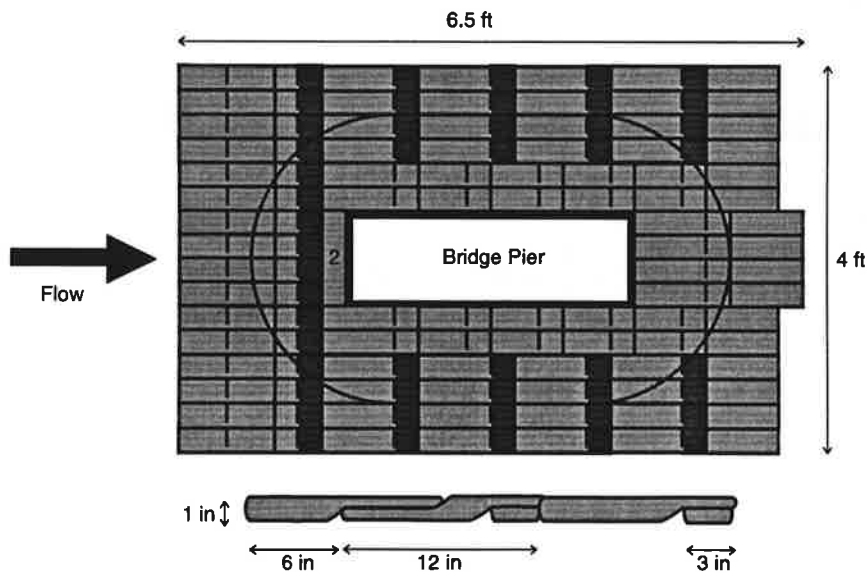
Placement of grout filled bags around the rectangular pier for series MC-GB3.
